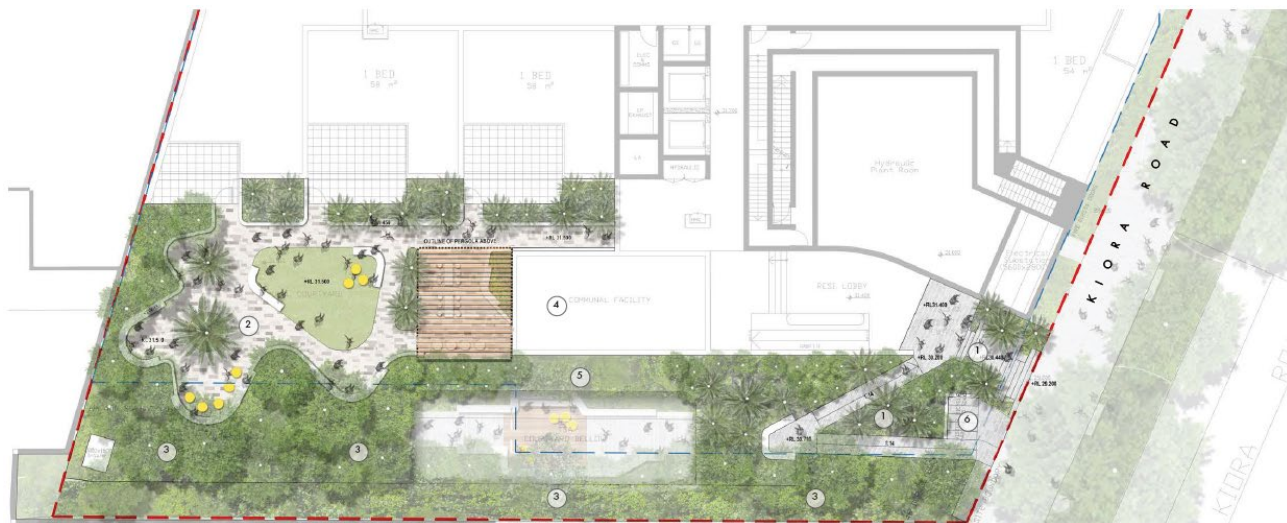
Level 1 Detail Plan – The Landscape Terrace
